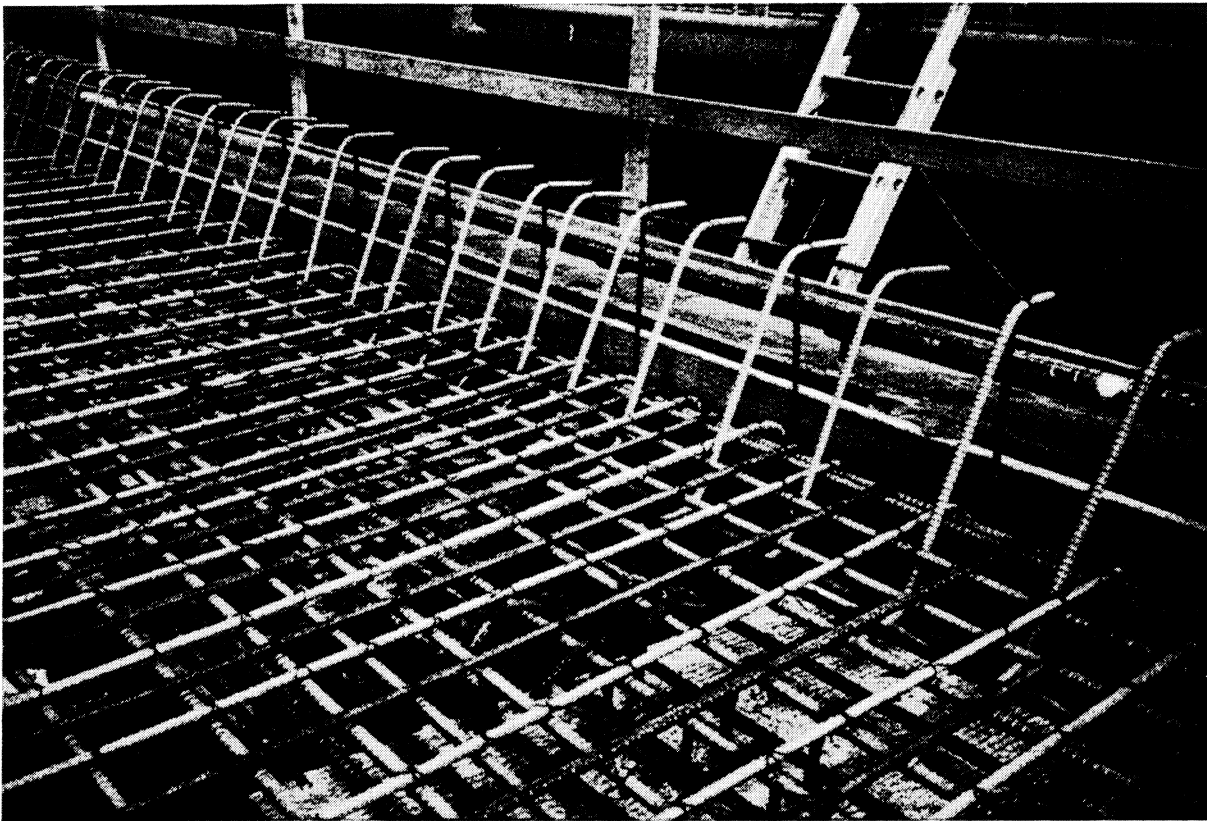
Field Test - Reinforcement in the Roadway Slab (portion of it can be seen)
